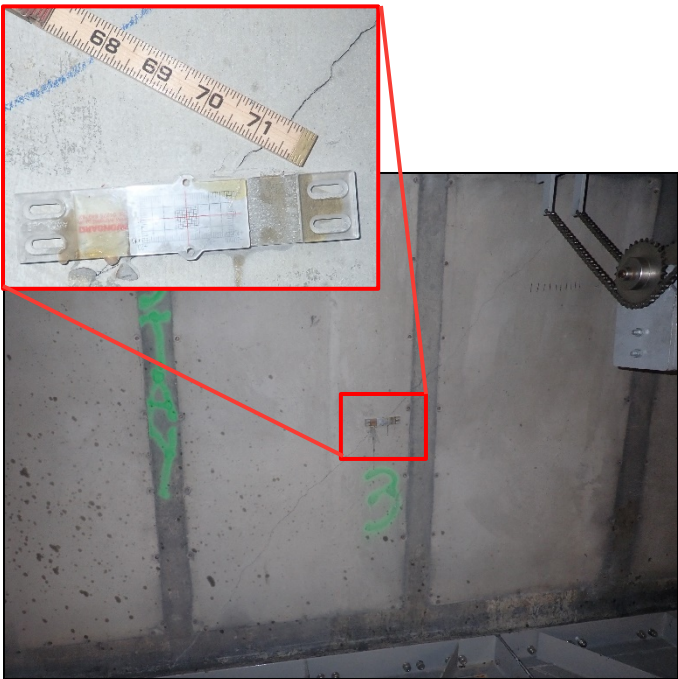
1/16" wide crack in north wall between plenum space and control room with installed crack gauge, south (plenum space) side shown, looking north
